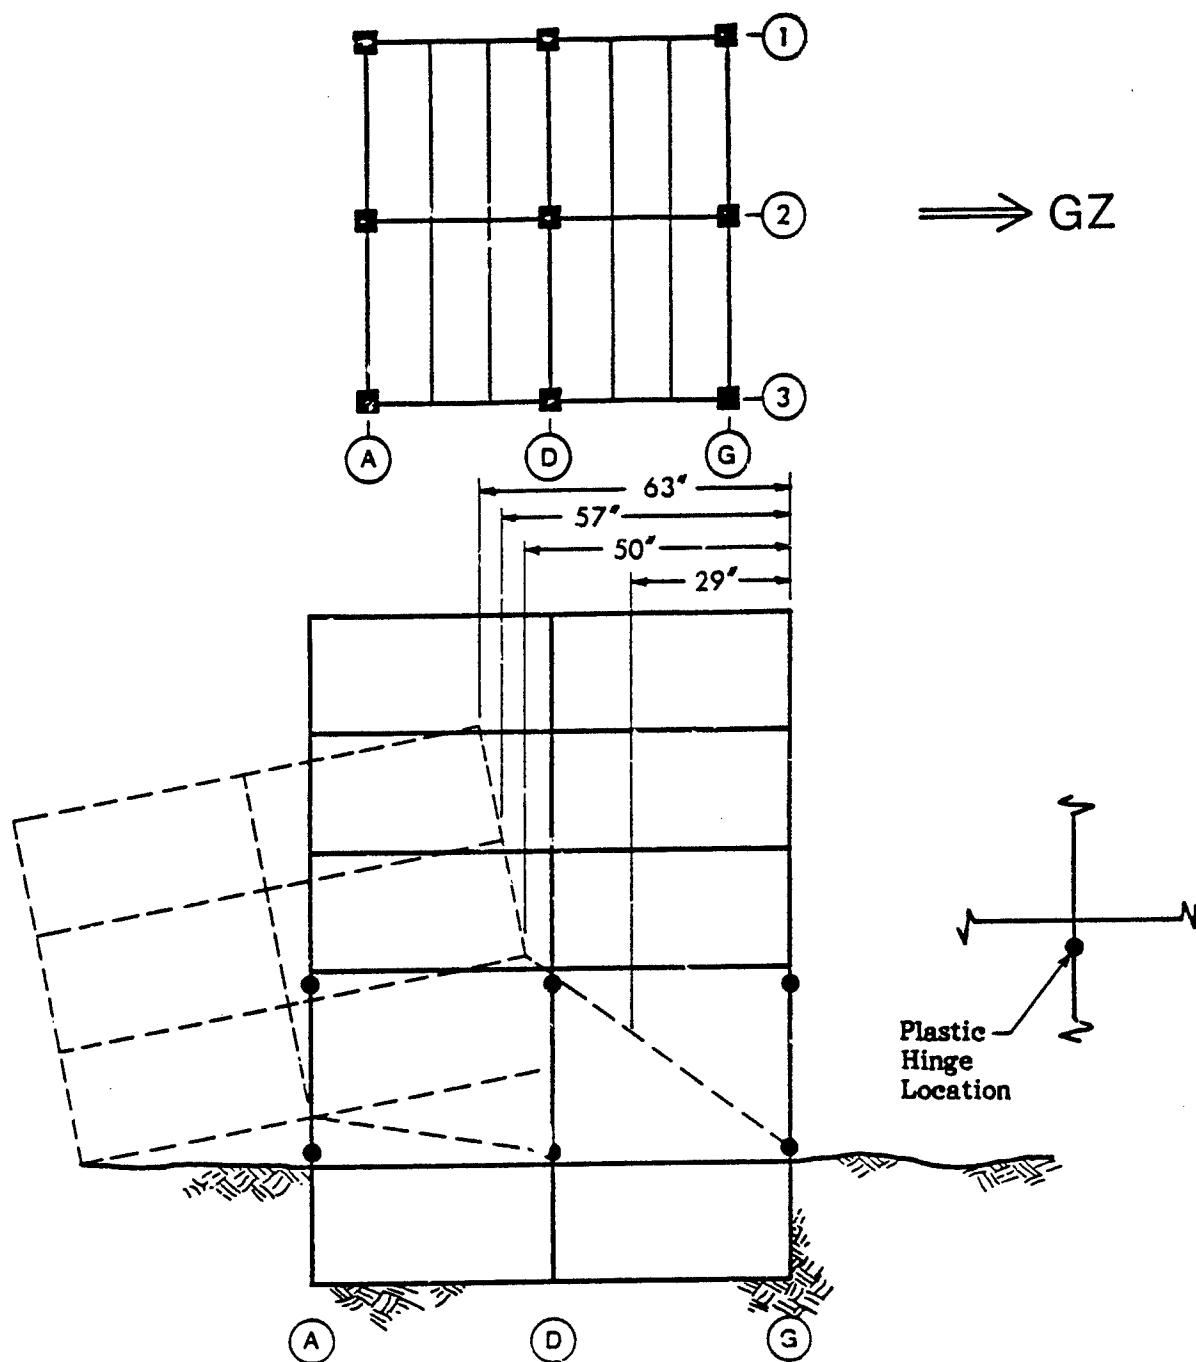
Final Deformed Position of Steel Frame Along Column Line ①.
